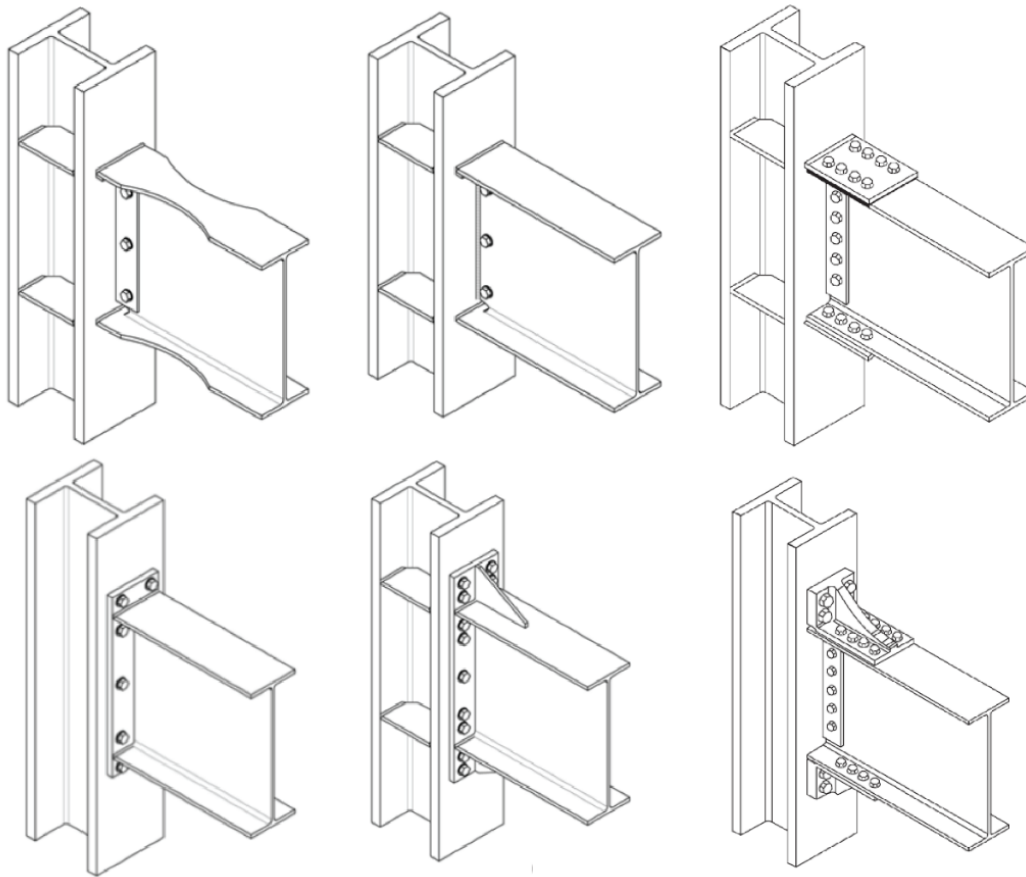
Isometric view of pre-qualified connections (from top left, clockwise: Reduced Beam Section (RBS), Welded Unreinforced Flange (WUF), Bolted Flange Plate (BFP), Kaiser Bolted Bracket (KBB), Welded Stiffened End Plate (WSEP), Welded Unstiffened End Plate (WUEP) (AISC 2016b))
